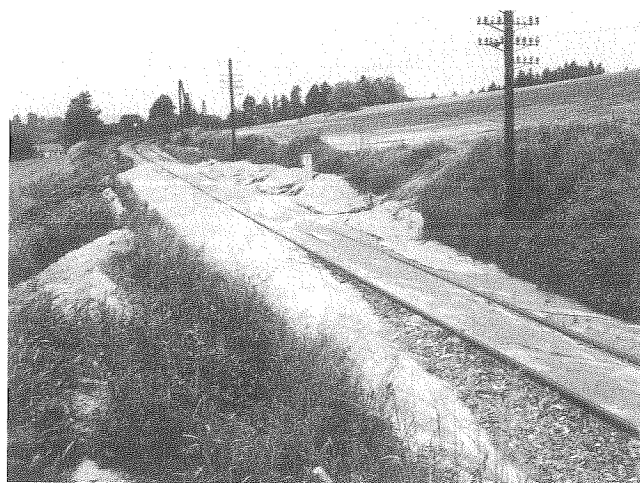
An alluvial fan of material carried from the dell floor onto a railroad track caused a train derailment and transportation breakdown (June 1987, area surrounding Bystrice n.P.).
